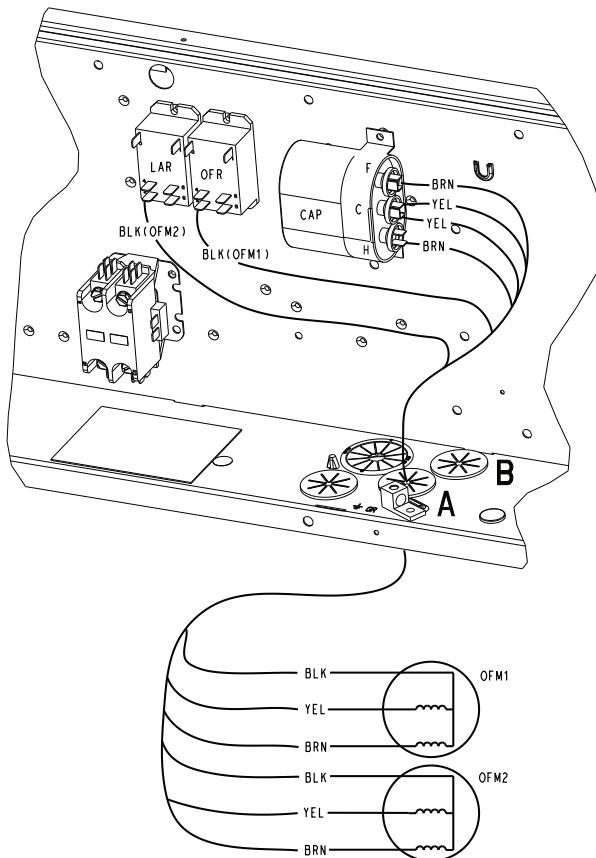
Cabinet A — Motor Wiring Inside Control Box
